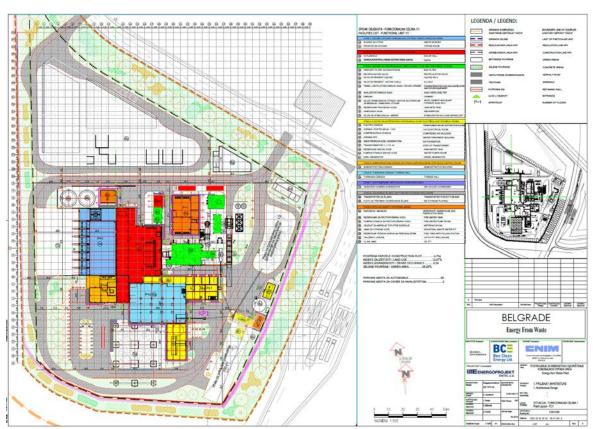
Layout plan - Functional unit 1 (Source: IDP, 1/1: Architecture Design - Main Facilities)
